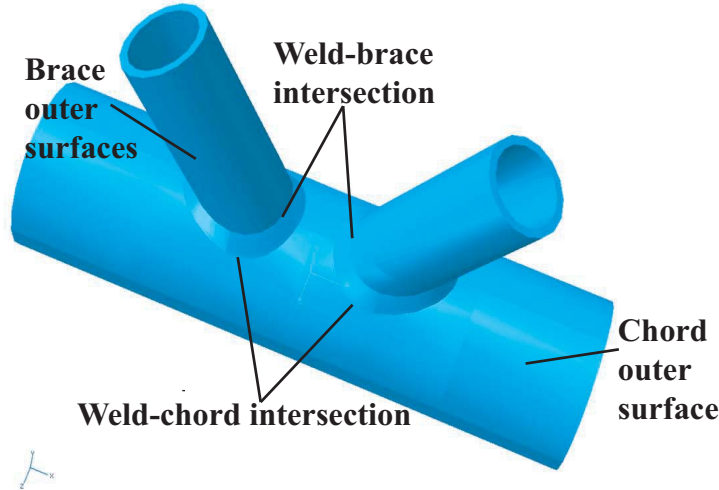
Definition of weld-brace and weld-chord intersections.
